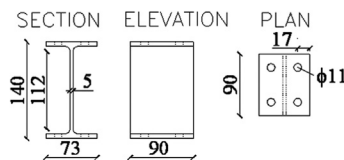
Test specimen: short length segments of I-shape steel sections (dimensions in mm).
